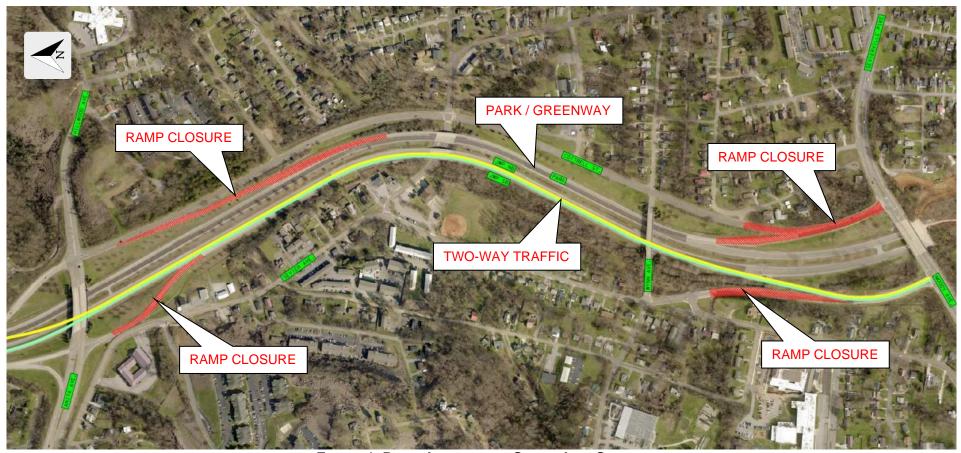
BUILD ALTERNATIVE SINGLE-LINE SKETCH
